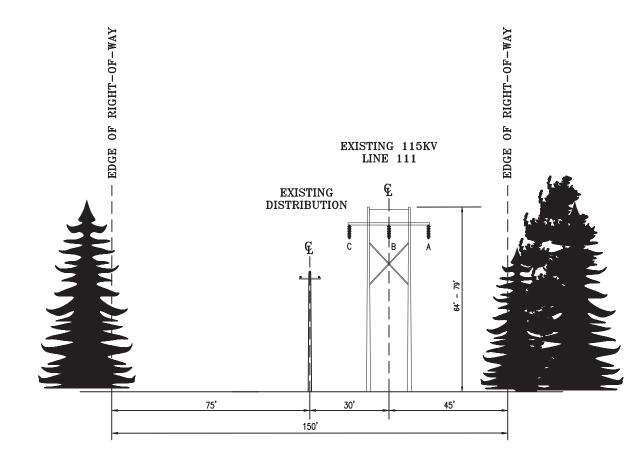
Typical ROW Cross-Sections / Plan & Profile Drawings
